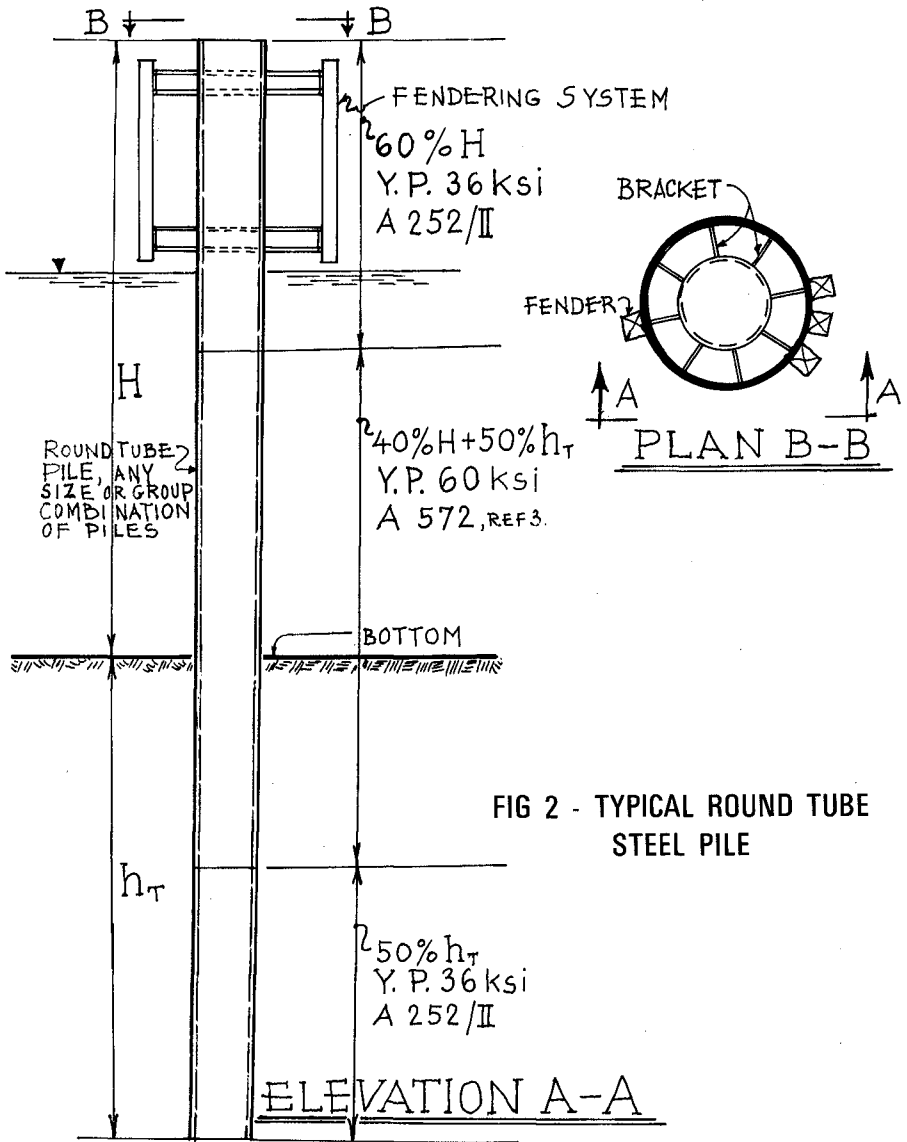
TYPICAL ROUND TUBE STEEL PILE
